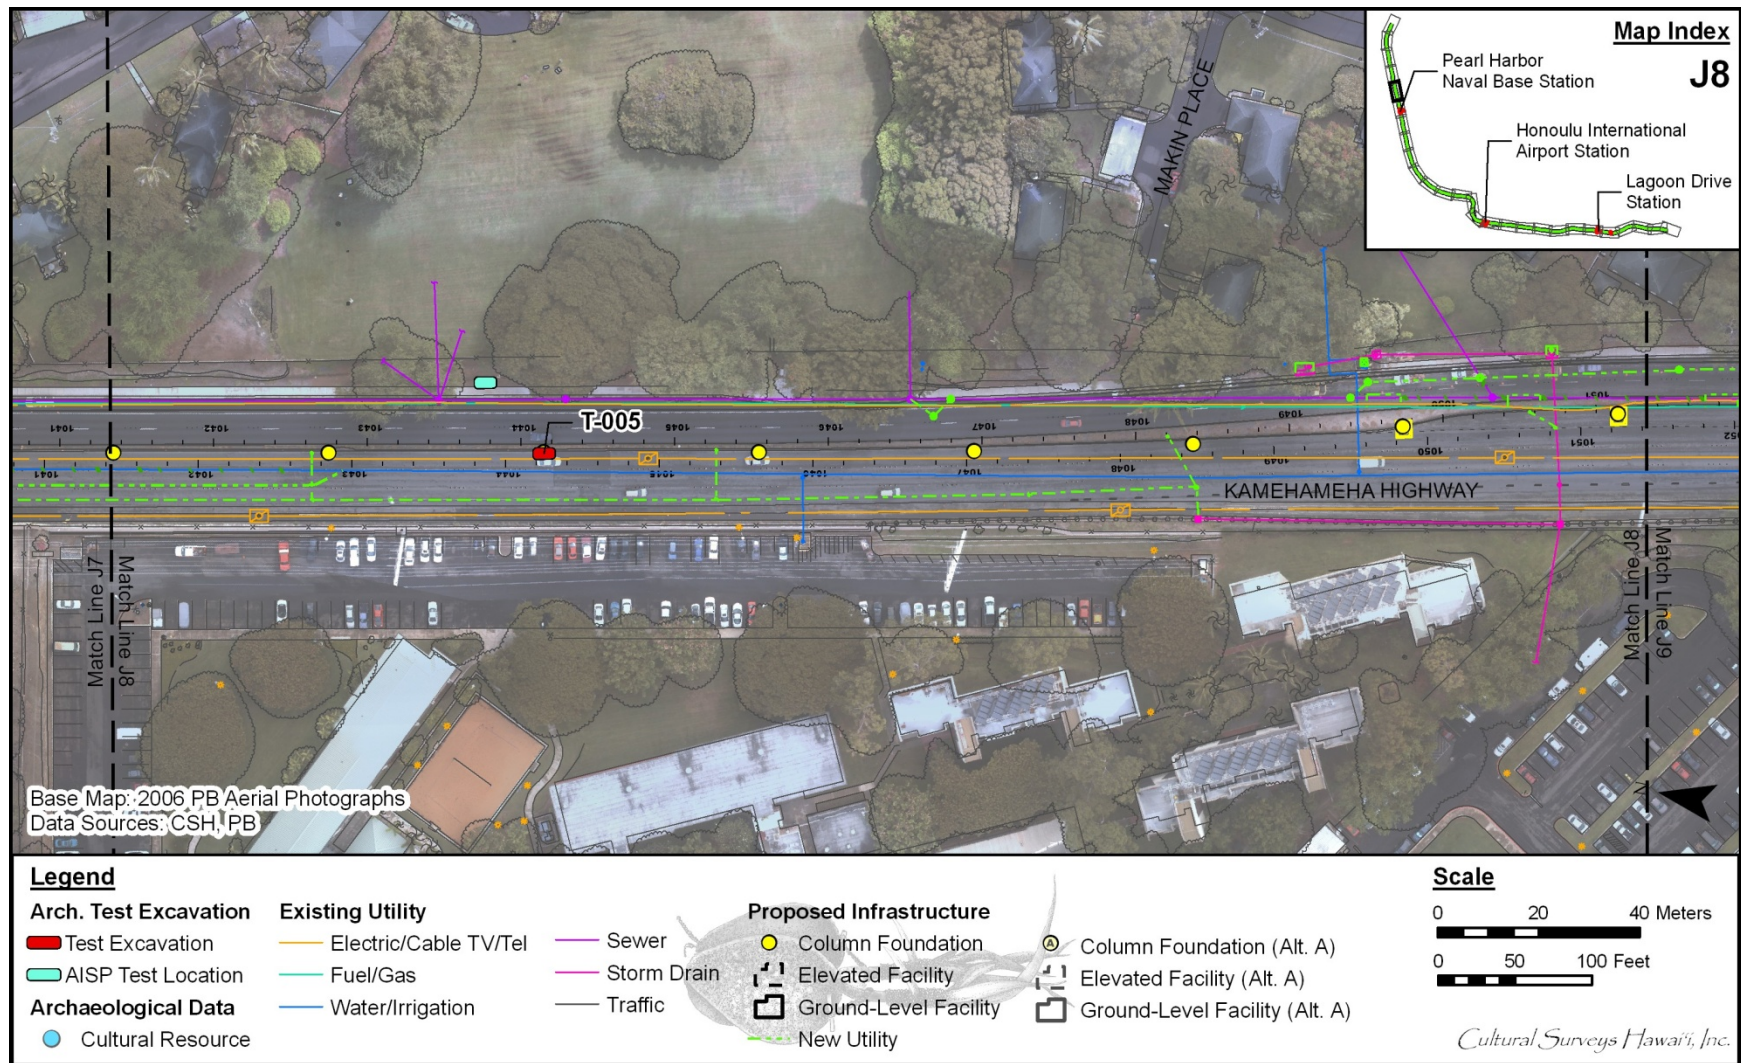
Map Sheet J8, one test excavation (T-005) near column foundation @ 1032+40
